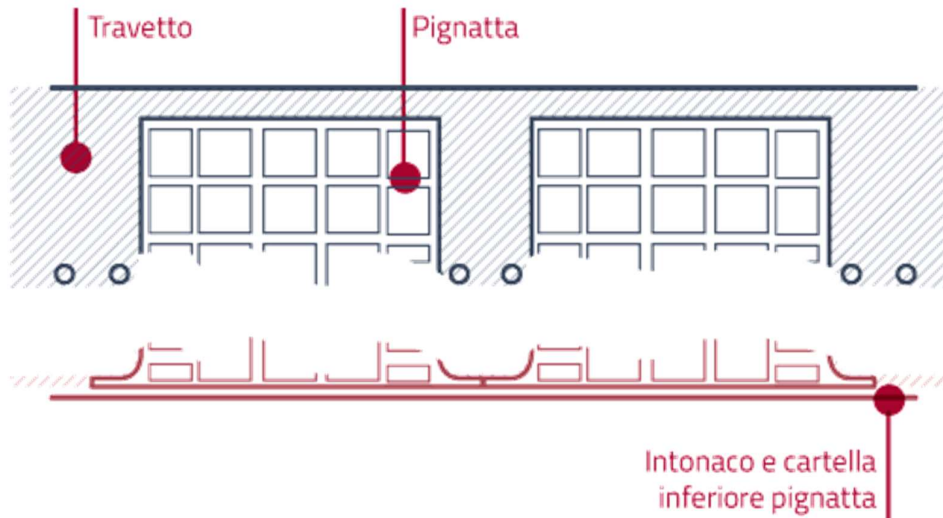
Diagram showing an example of a section of the brick and concrete ceiling with the underside detached
